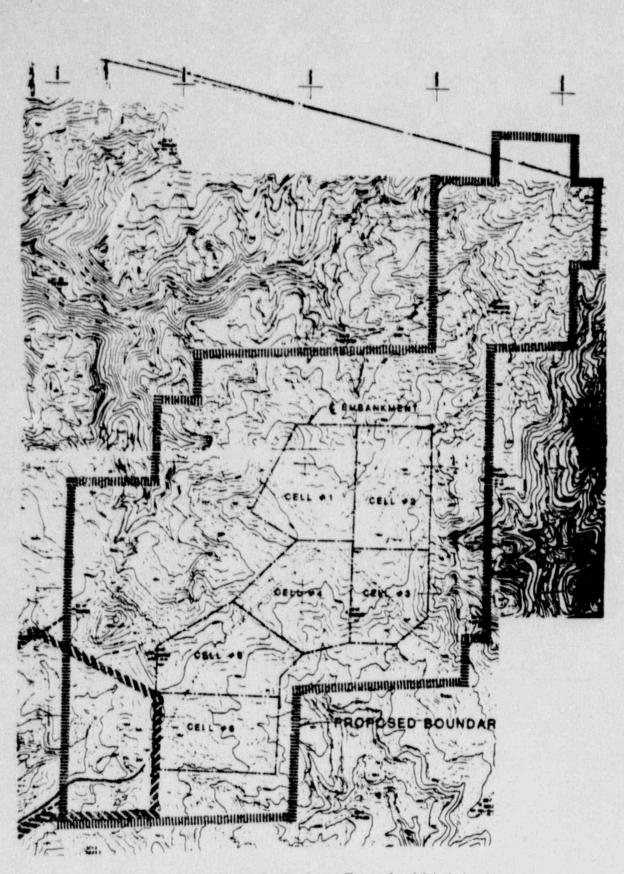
Topographic casp of proposed new tailings ponds and their site boundary.
